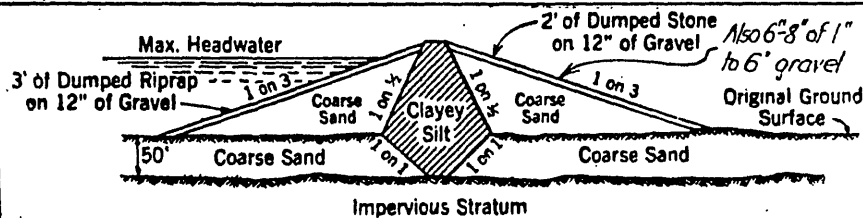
FIG. B - DESIGN FOR SITE WHERE CLAYEY SILT & COARSE SAND ARE AVAILABLE - FOUNDATION SAME AS FOR FIG. A.
